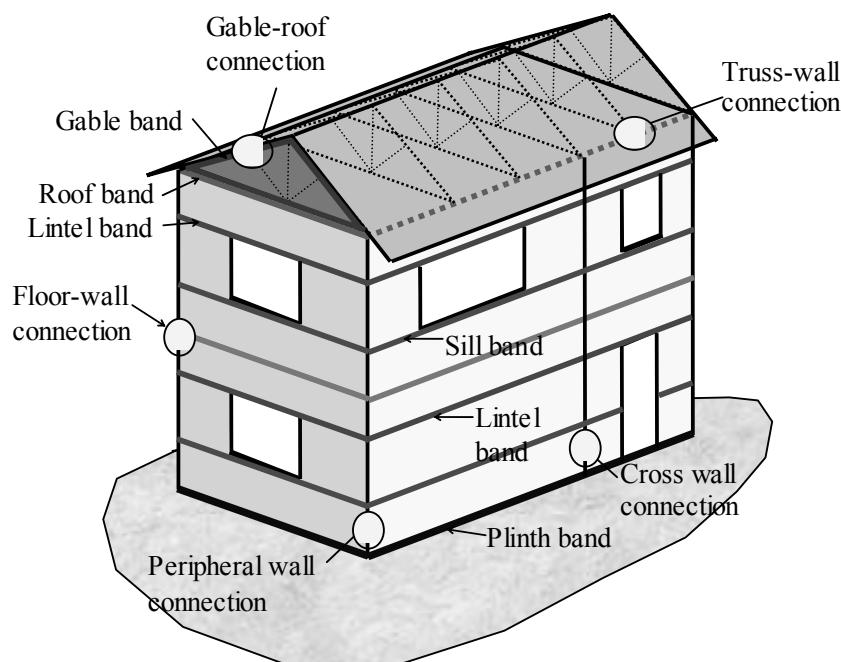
Bands at plinth, sill, lintel, roof and gable levels and other connections
